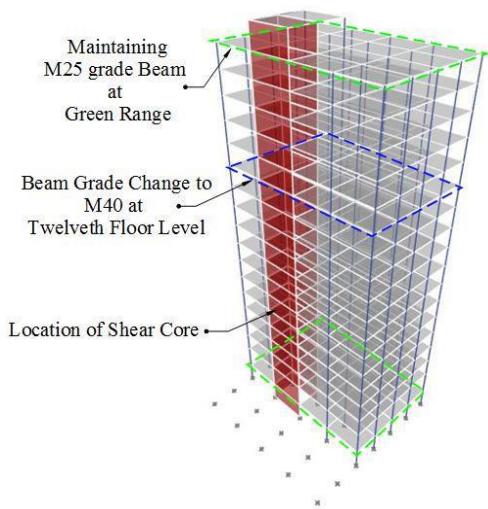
Beam Stability Case - Beams of different sizes (All M40 grade beams at twelfth floor level): Case BS5
